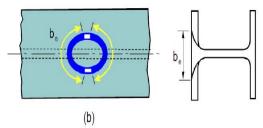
Model for Failure of the truss element (diagonal) through local yielding and buckling
